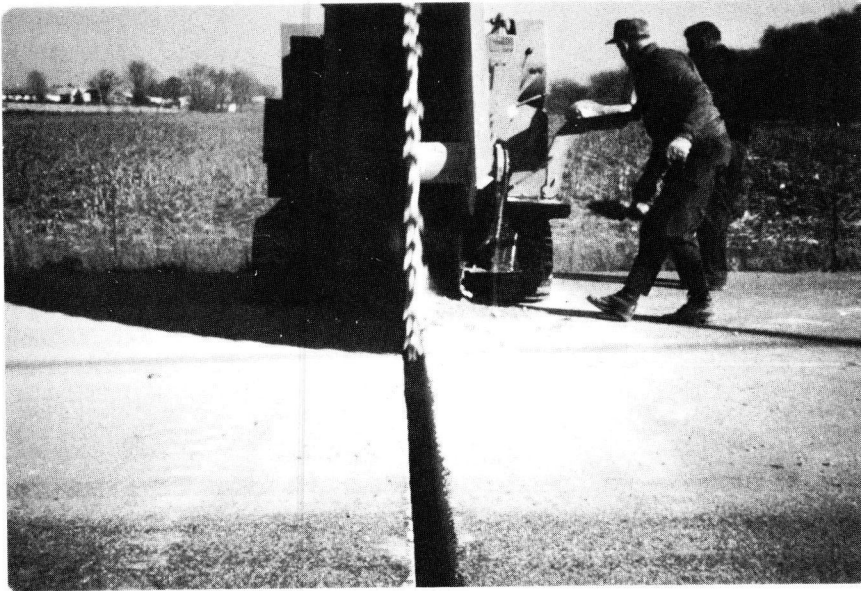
Wheel cutter used to cut an expansion joint in concrete pavement.
